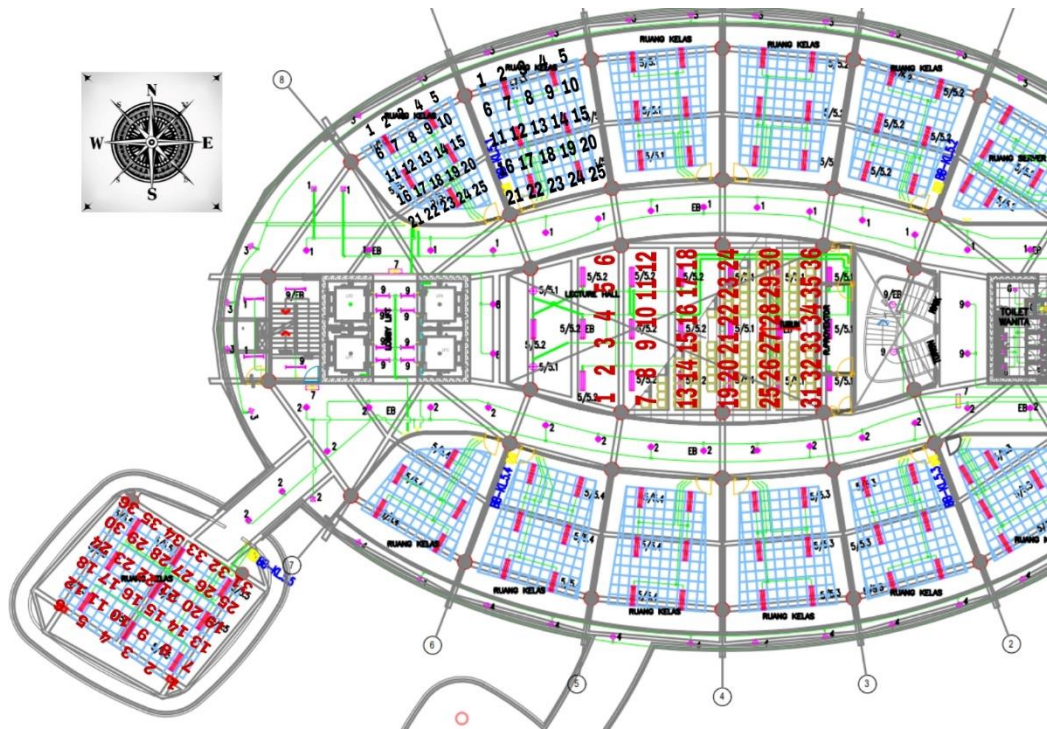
Tower C Class and Meeting Rooms Measurement Points in Third Floor
